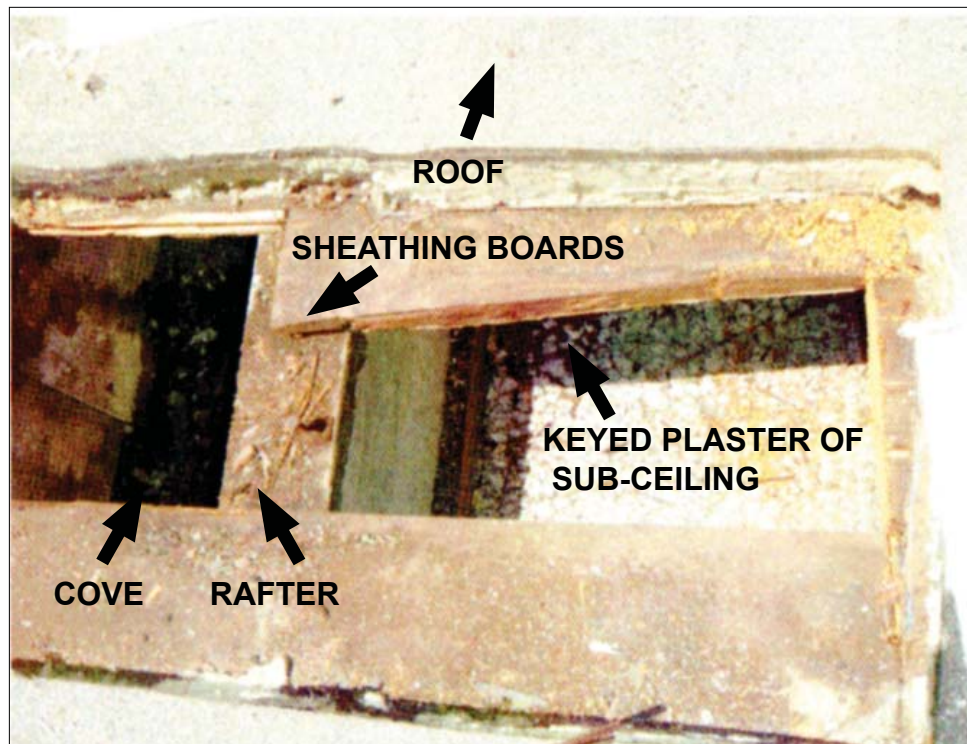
Roof probe towards the west wall, with cove to the far left, roof rafter and keyed plaster of sub-ceiling in the center (Kaitsen-Woo, 2008).
